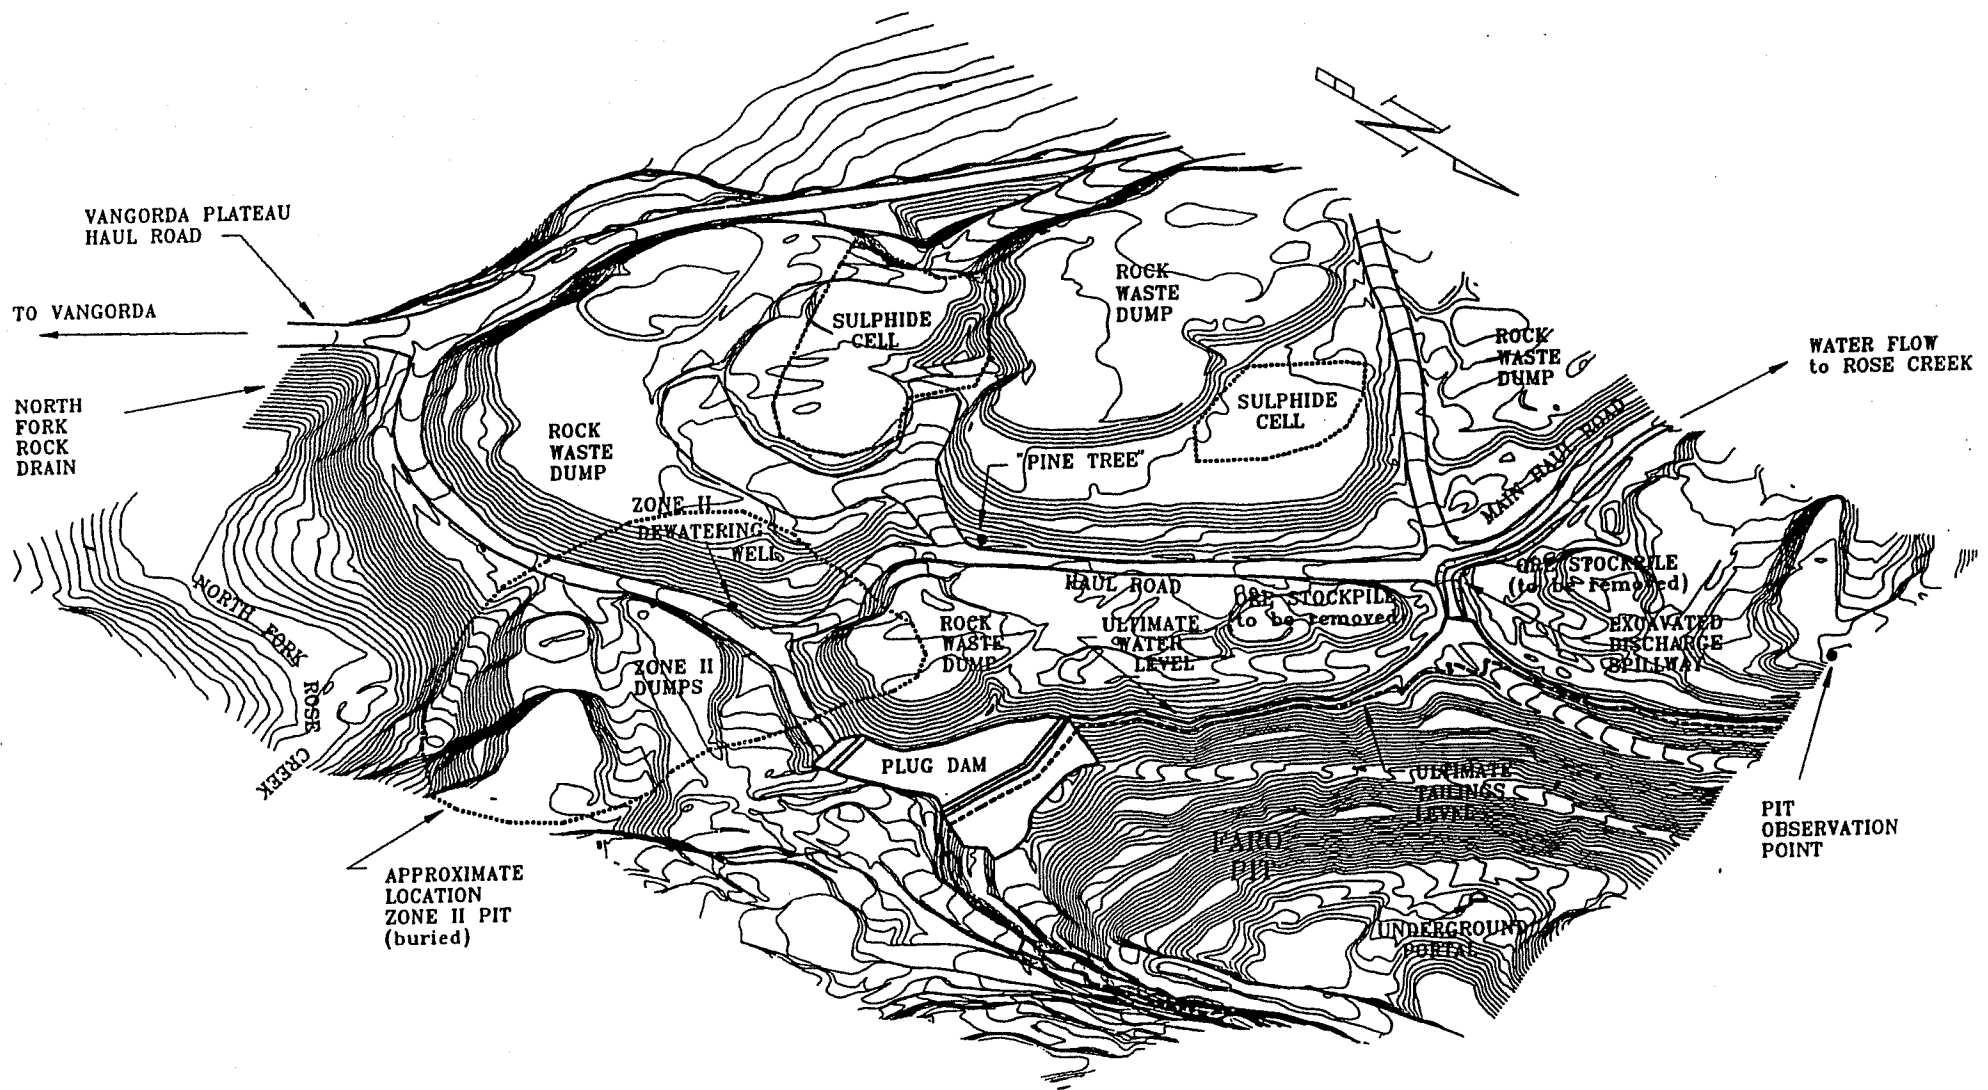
Oblique view (looking southwest) of the south side of the Faro Pit and a portion of the Waste Rock Dumps to the southwest showing the water control system that will be in place when the pit is flooded. The level of pit flooding will be raised by the Plug Dam so that water will flow out of the pit to the west, rather than the southeast, to the North Fork of Rose Creek as proposed in the 1988 plan. Discharge from the Lake in the pit will be through an excavated spillway on the south pit wall and then via a channel following the current main haul road and portions of the North Wall Interceptor to Rose Creek (now shown).
